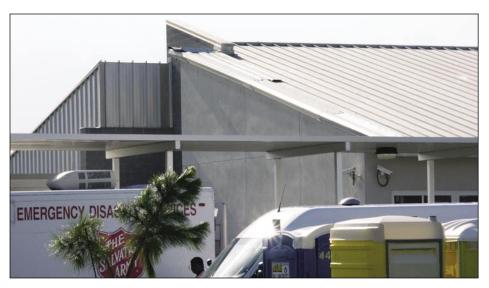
Several of the architectural panels and hip flashings blew off this fire station (Deep Creek).
